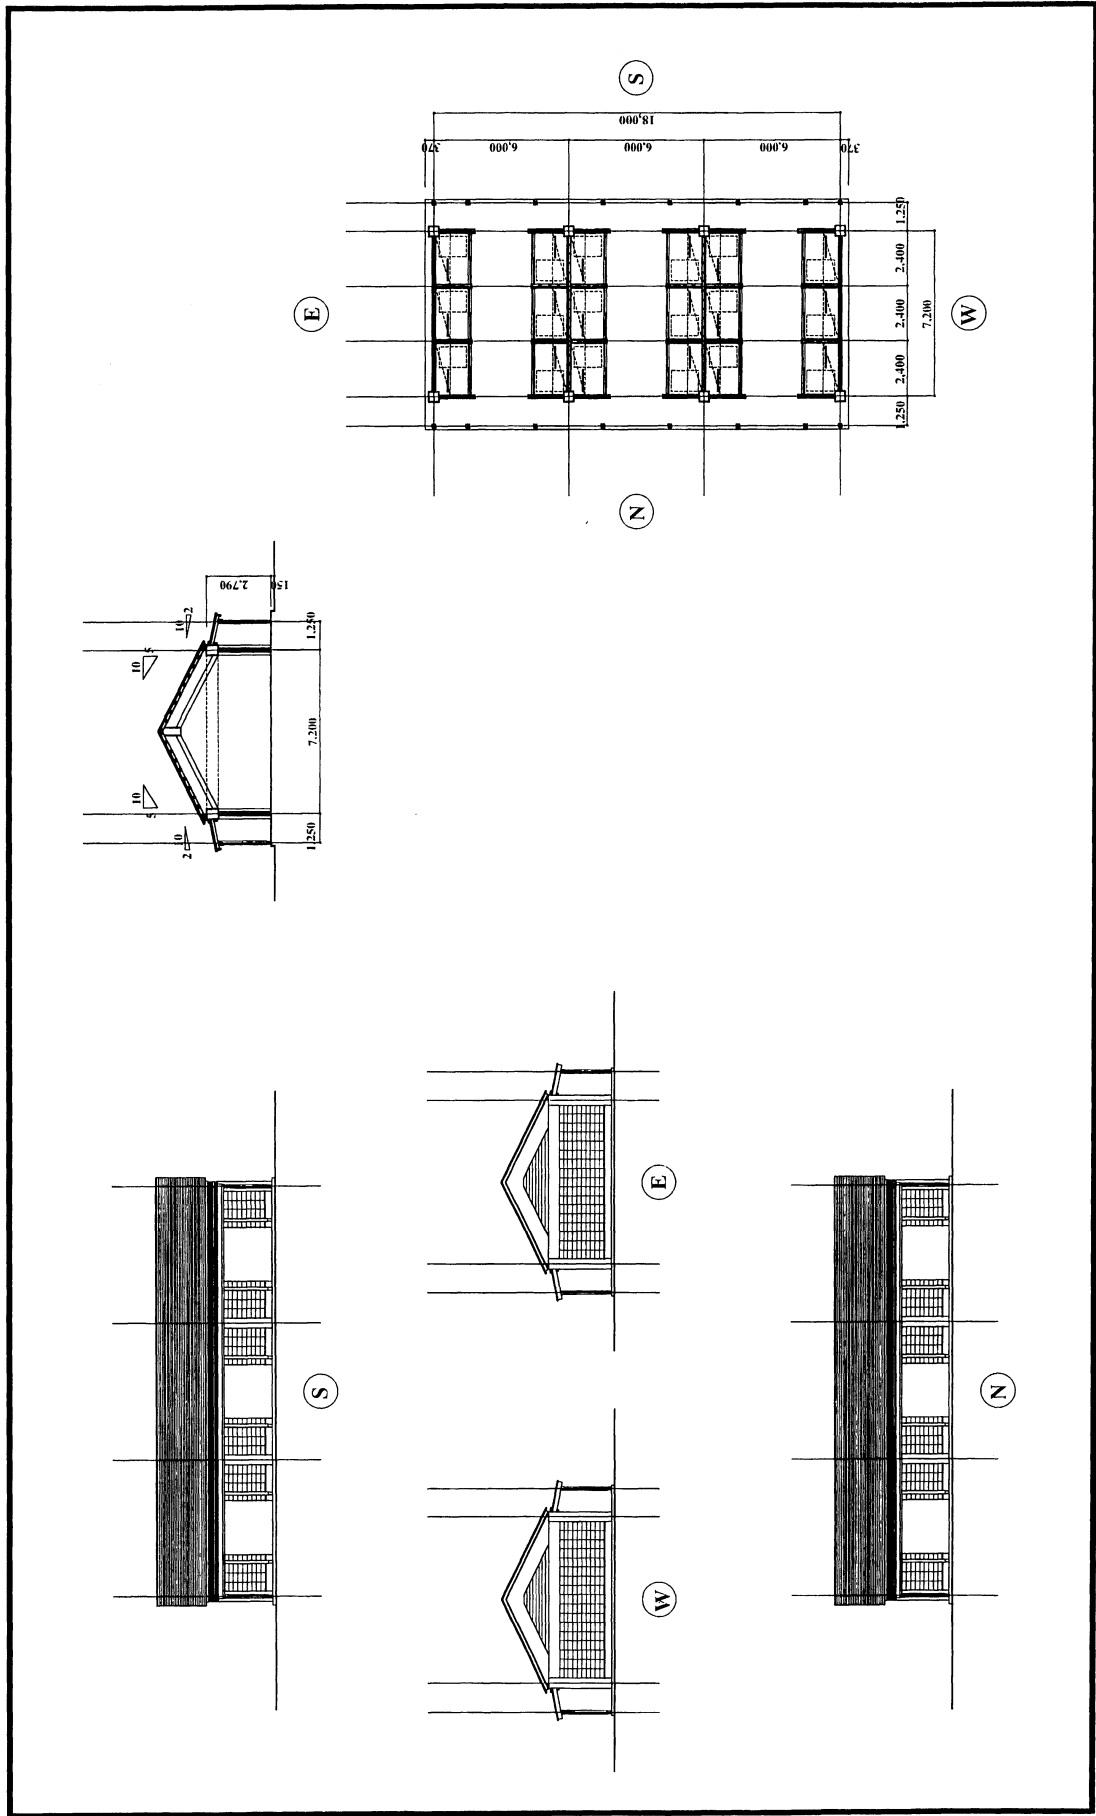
(2) Plan / Section of Gear Locker
